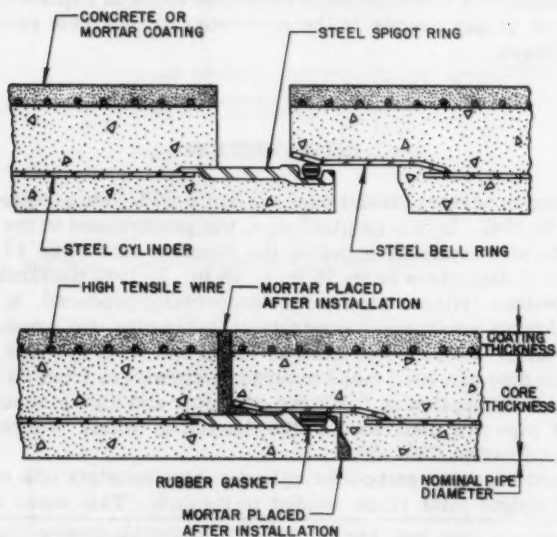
PRESTRESSED CONCRETE EMBEDDED CYLINDER PIPE
